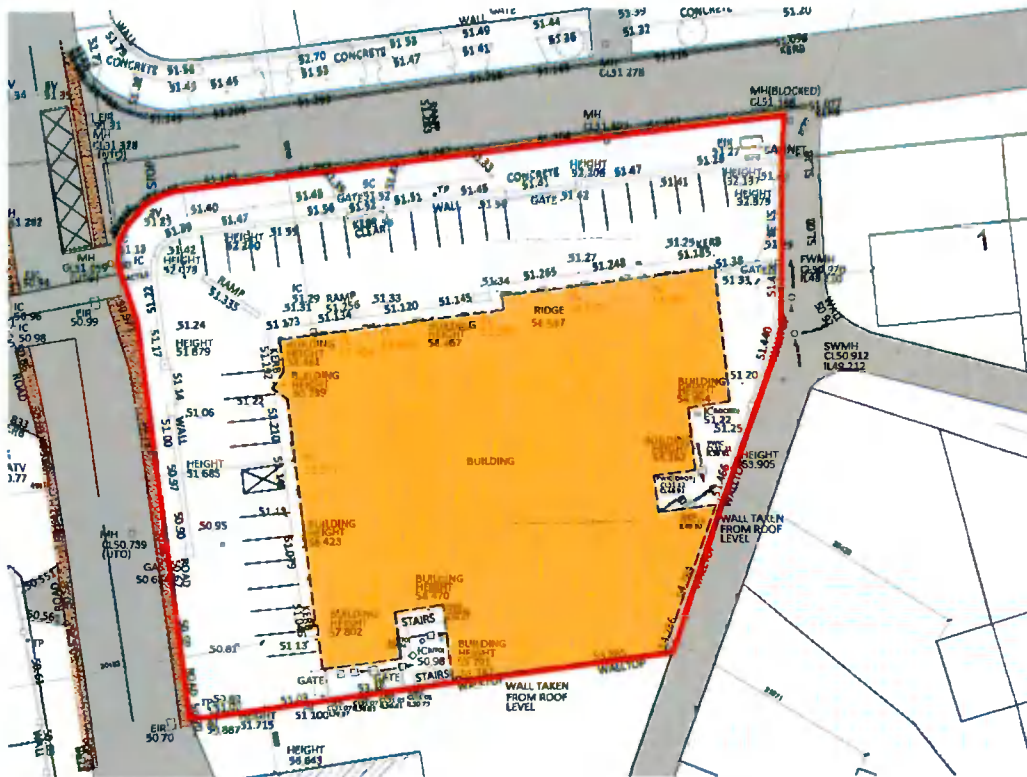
Existing Site Plan (Roof shown hatched in orange)
